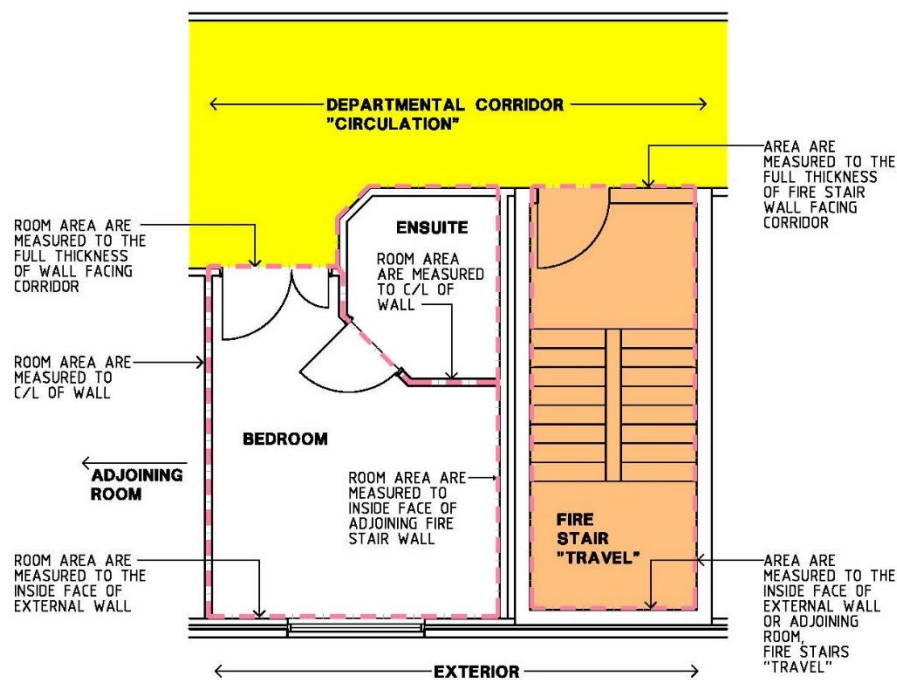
Typical Room adjoining Departmental Corridor with adjacent Travel Area
